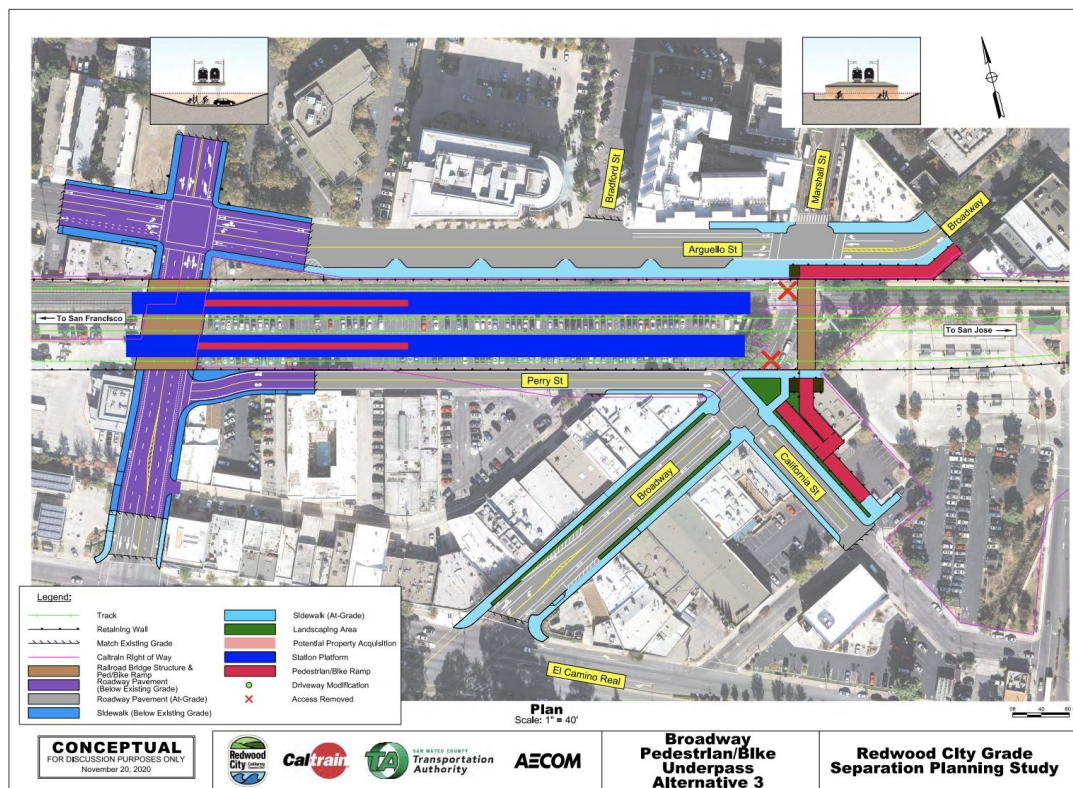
Changes to Broadway for Design Alternative 3 (Redwood City, 2020)
